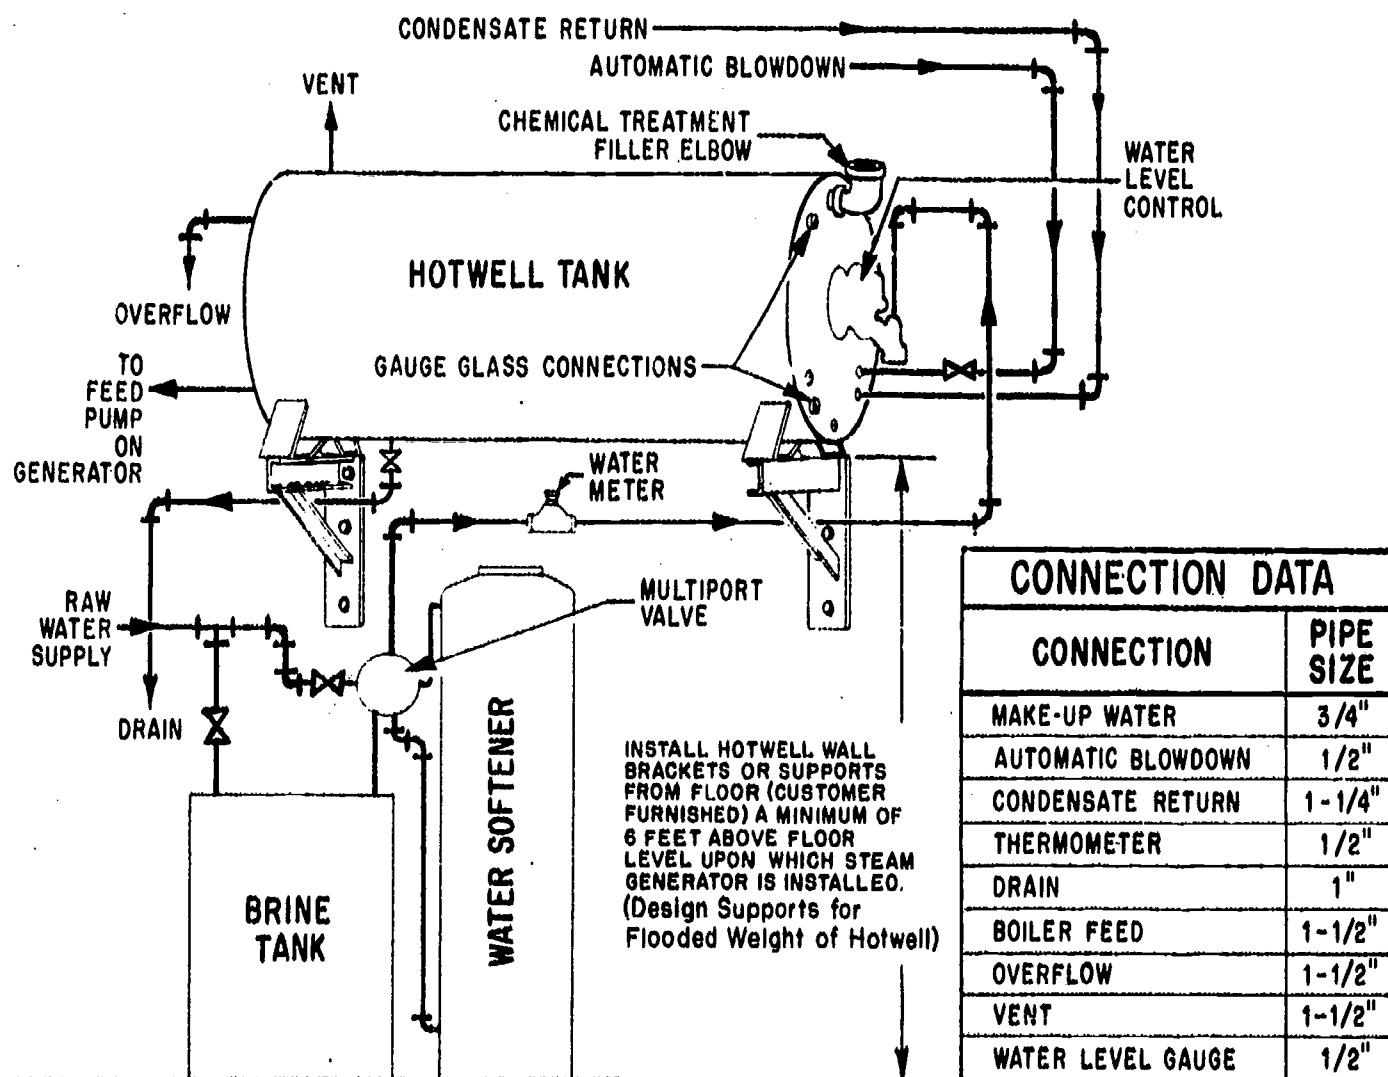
A typical installation of horizontal hotwell and connection data.
